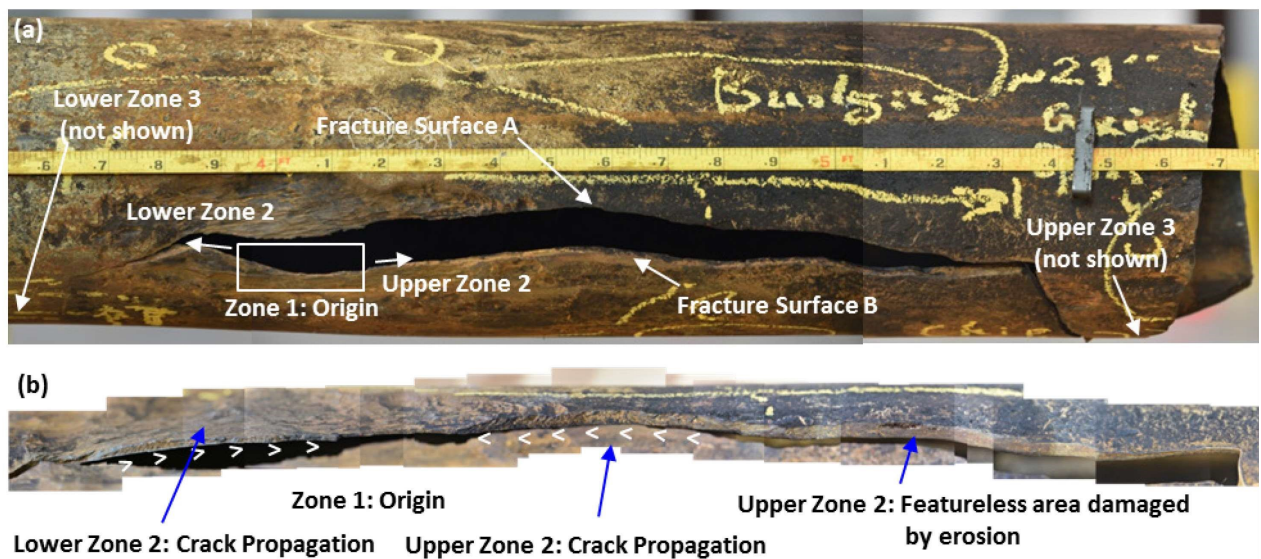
(a) Front and (b) Top Views of Fracture Surface B Identifying the Three Zones
